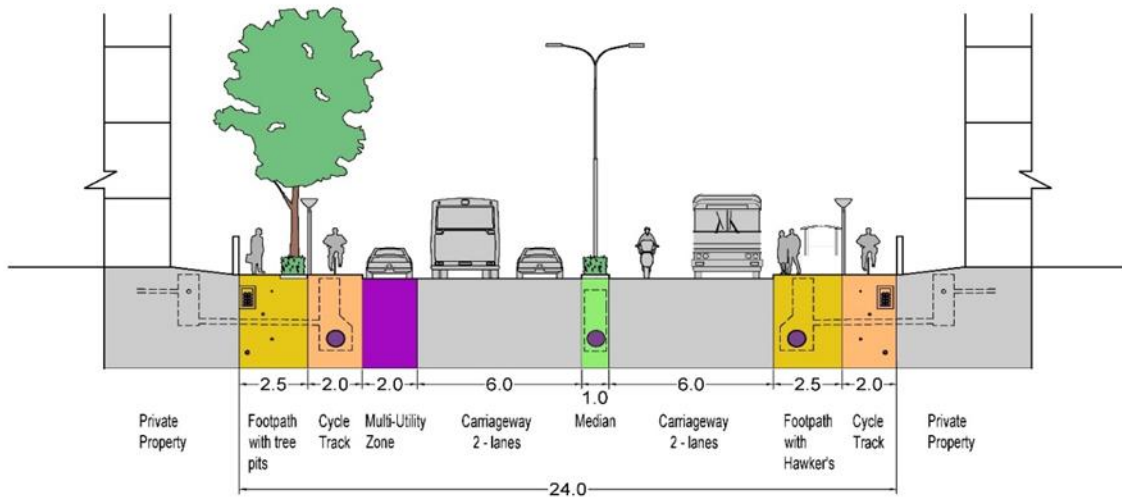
TYPICAL SECTION OF 24M WIDE ROAD
